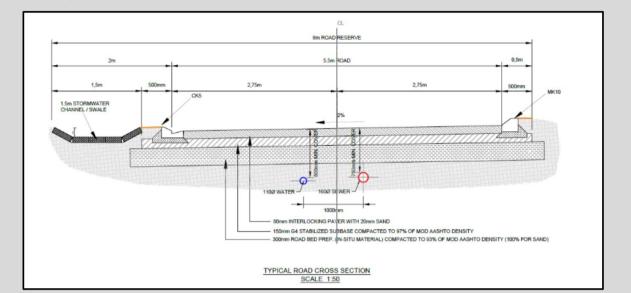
Typical road cross-section (Vita Consulting Engineers, 2023).
